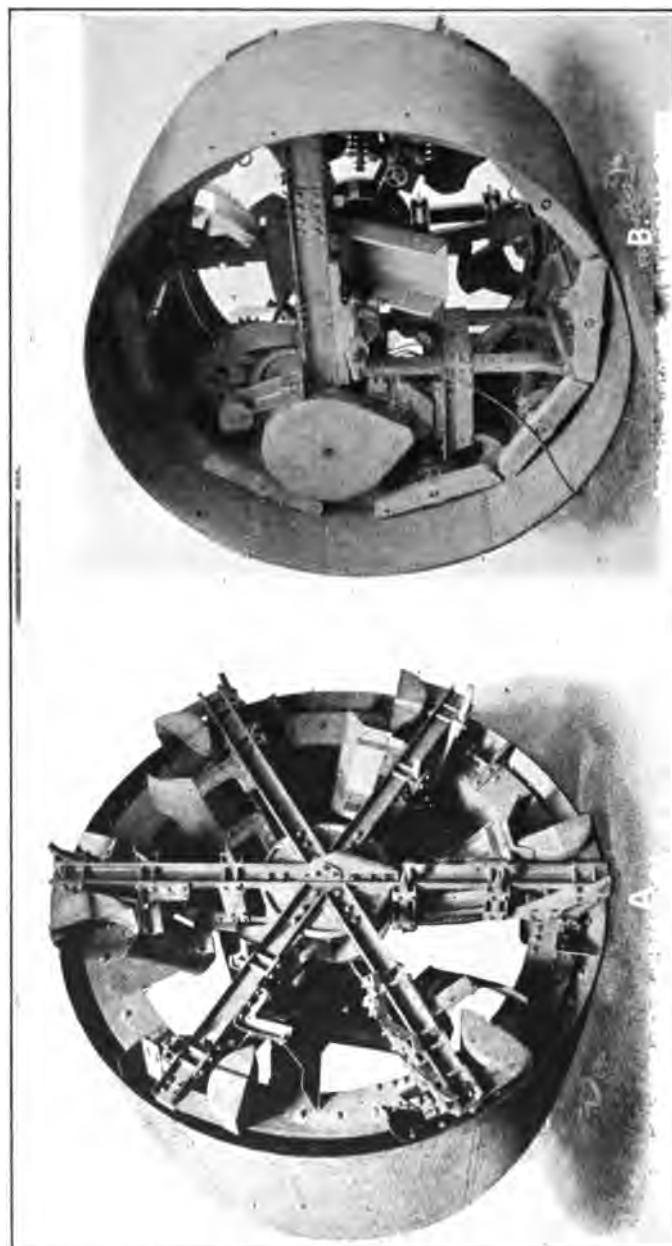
The John Price rotary cutter in a small shield to work in London clay. (A) Rear view. (B) Front view. (From *Trans. Am. Soc. C. E.*, vol. 54, Part F.)
